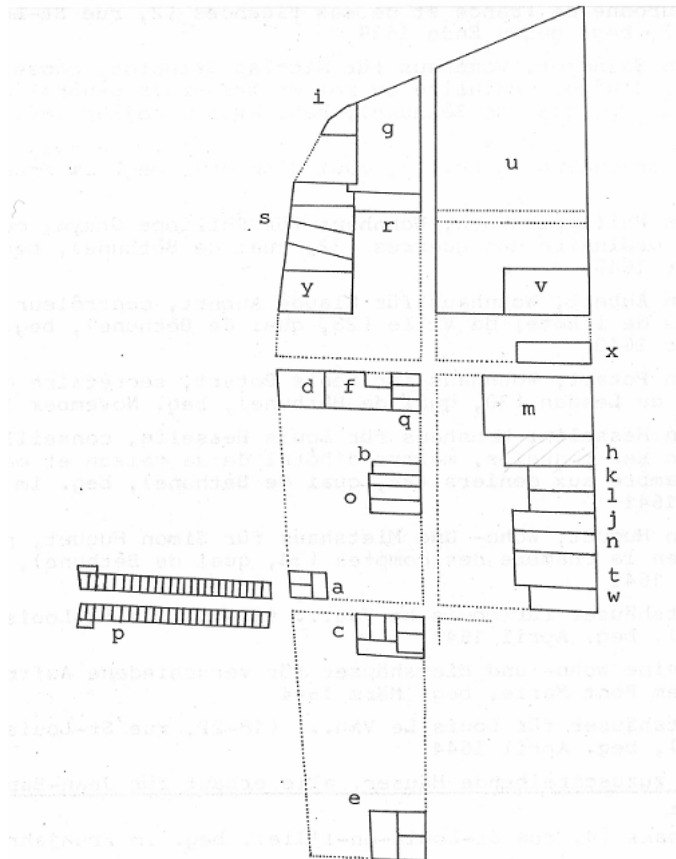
Pont Marie and Île St.-Louis, Plan of Plots, Reconstruction M. Mislin
